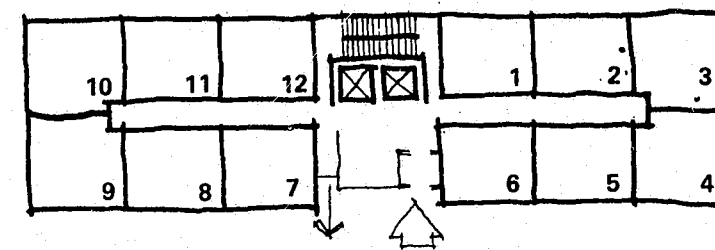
Ground-floor plan of a high-rise elevator building in which the secondary exit from the building has been placed 15 feet from the main entry. This is only permitted by building codes in some municipalities.
